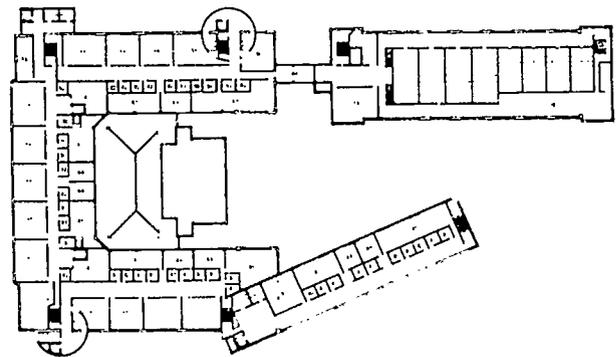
Nathaniel Hitchcock, project for Prospect Heights, typical floor plan
